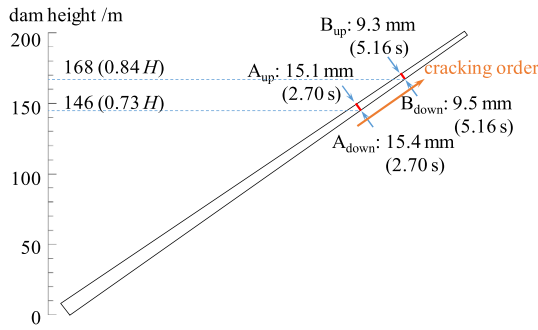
Crack location, maximum crack width, and initial cracking moment of the concrete face slab during earthquake.
